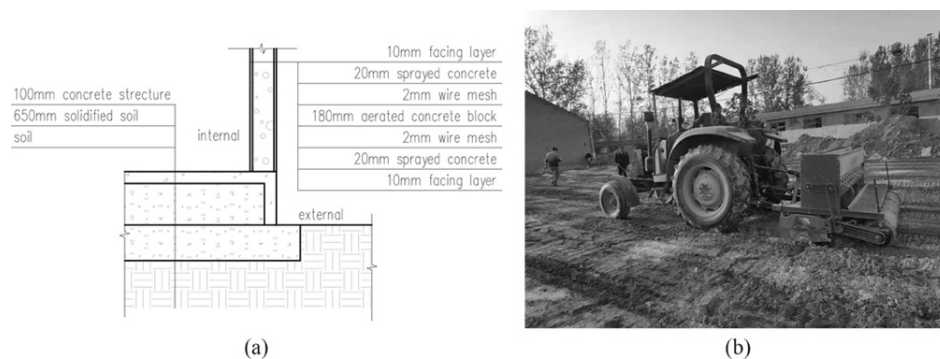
Construction detail (a) and the construction process (b) of the foundation
